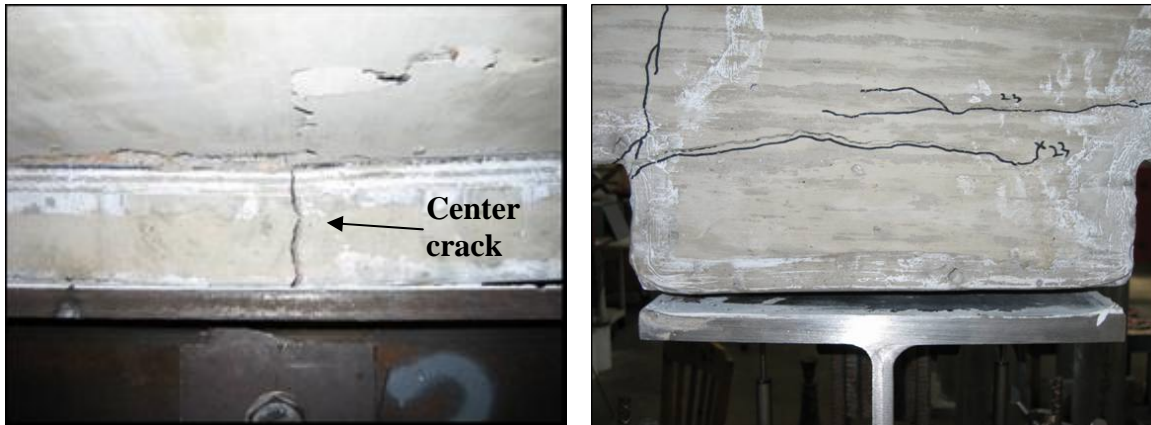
Initial cracking in specimen with a 3-in. haunch
